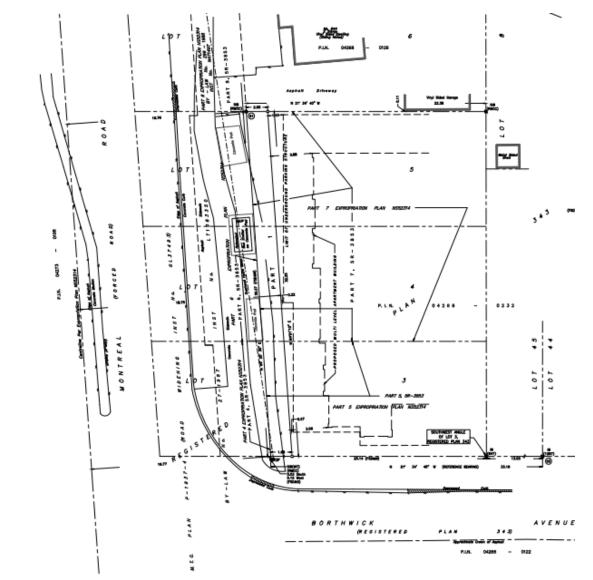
Draft R-Plan for Road Widening, prepared by Fairhall, Moffatt and Woodland (September 7, 2021)
